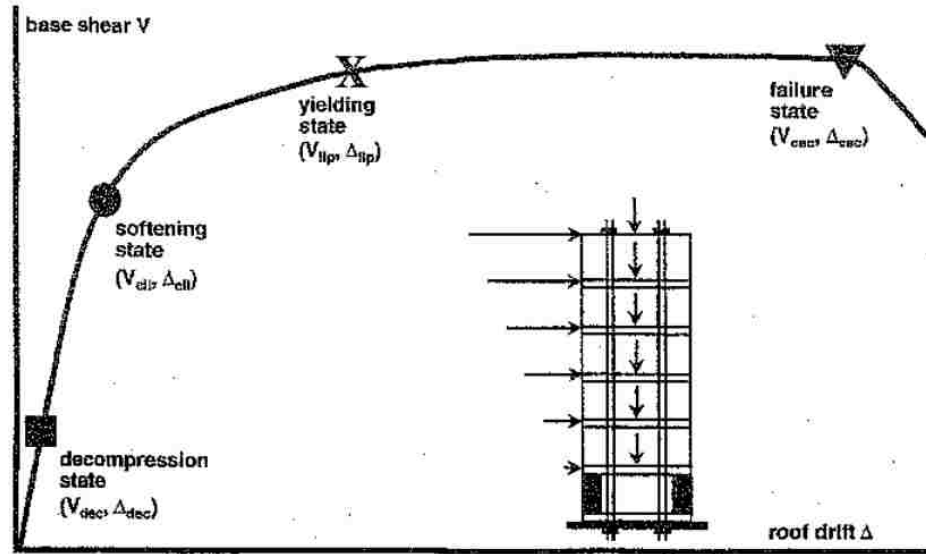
Schematic base shear versus roof drift with limit states for unbonded post-tensioned precast concrete wall, from [43]
